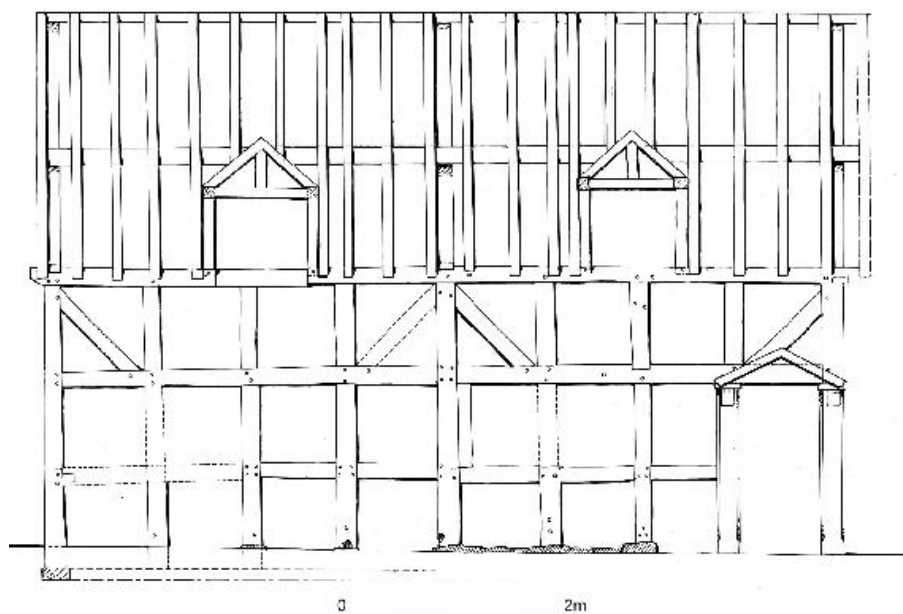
The street elevation of the Essex Arms in 1988; the basic framing was mainly intact but the building was in a poor condition
